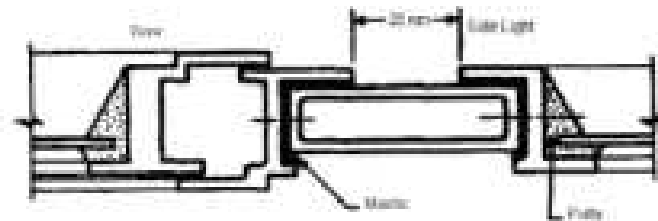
Coupling Section Extruded for Coupling Door to Window or Side Light
